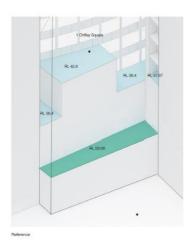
| Proposed massing to the rear – north-east corner (Source: Woods Bagot)
